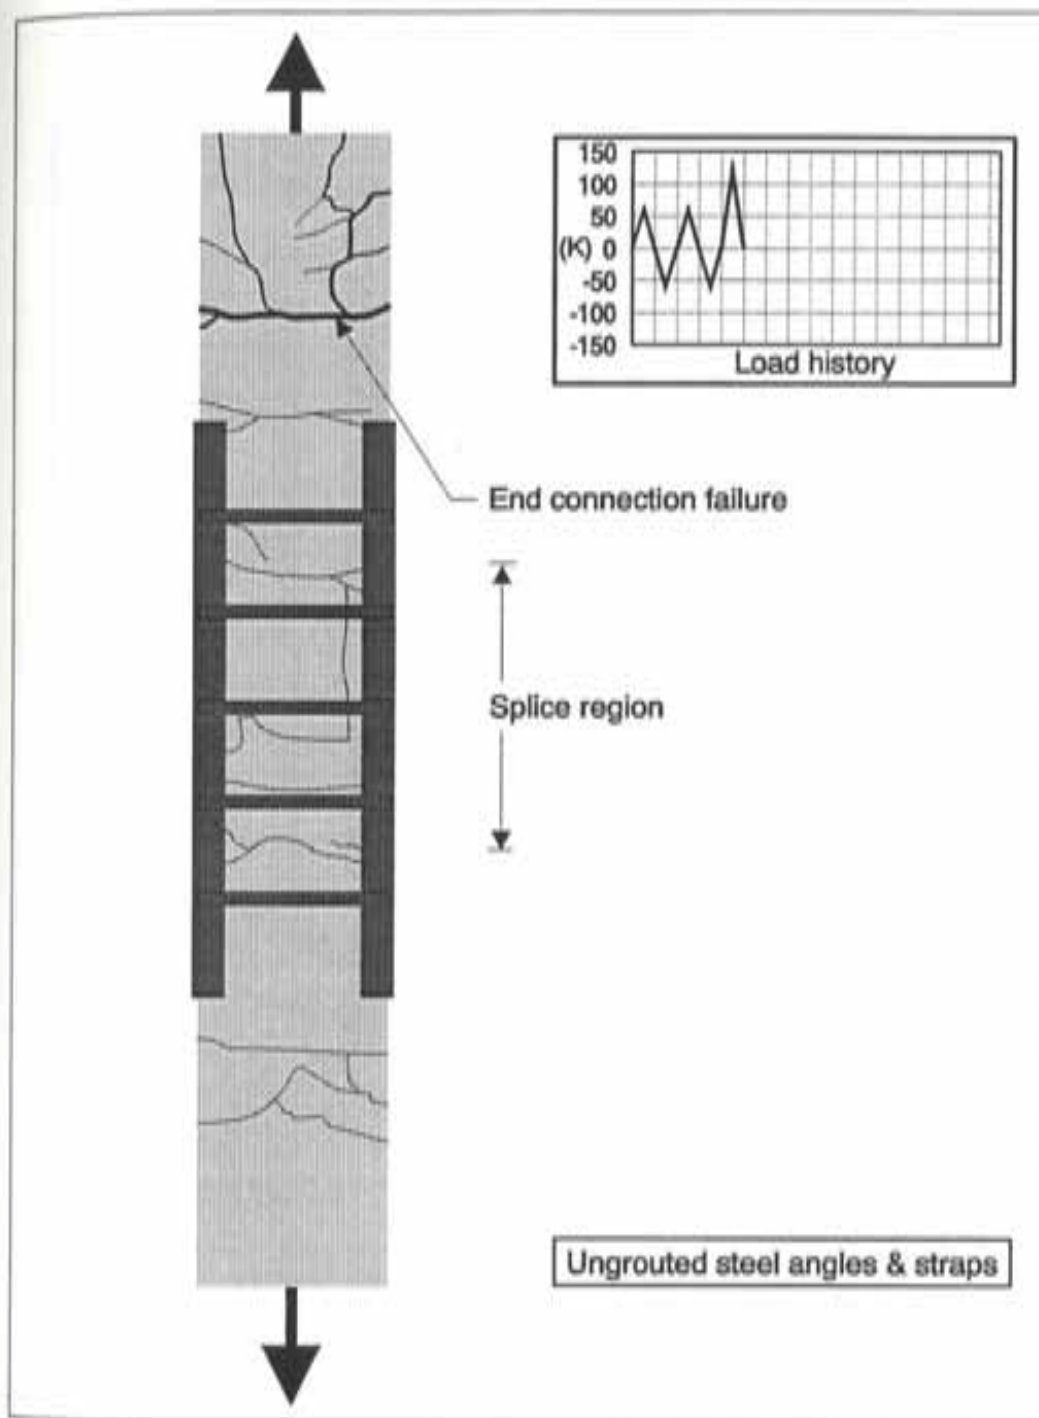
Crack pattern in specimen U-SS6-UG-2
